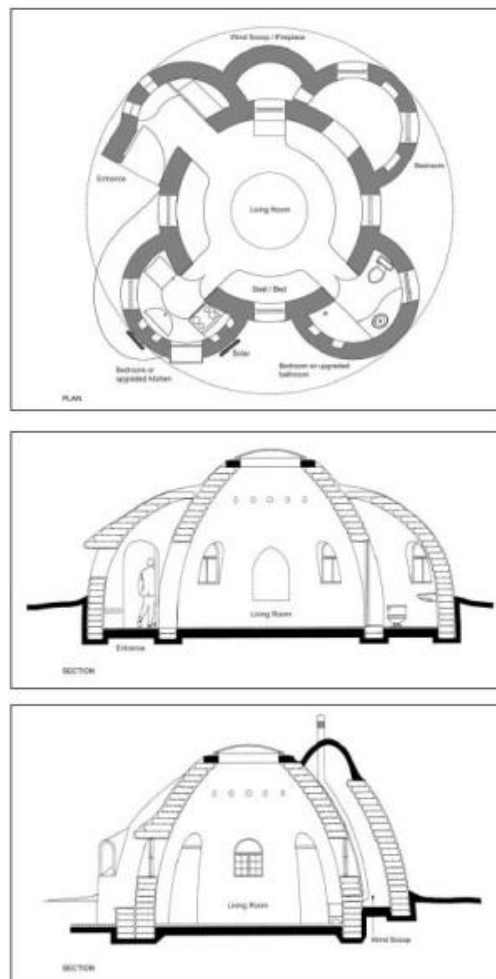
A simple plan of one of the houses built by cloud clay (Saeed Sun, 2012).
